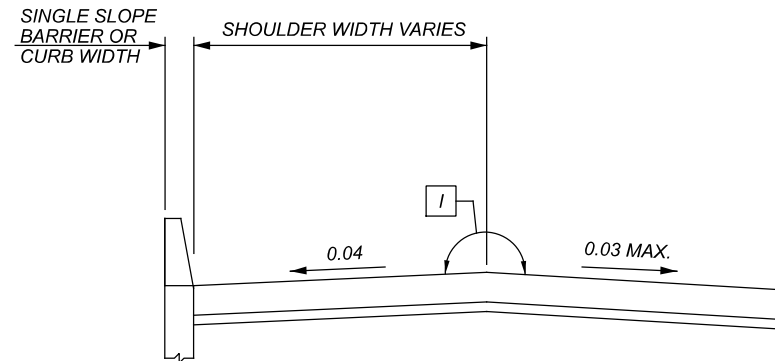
UN-CURBED-HIGH SIDE OF SUPERELEVATED SECTION
